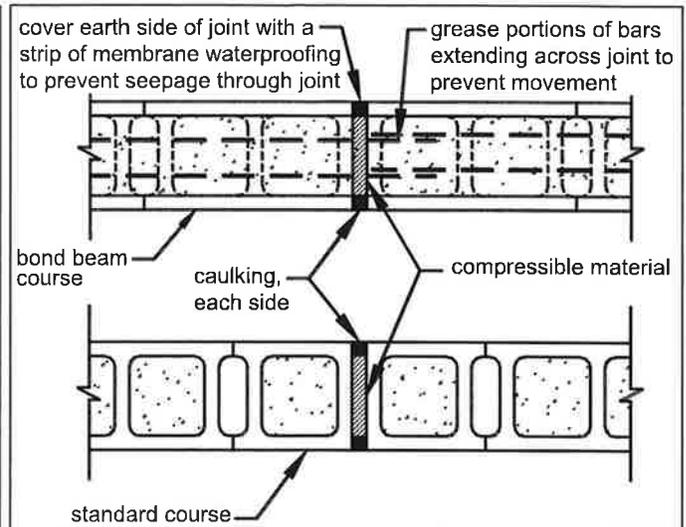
TYPICAL DOWEL AND KEYWAY DETAIL
